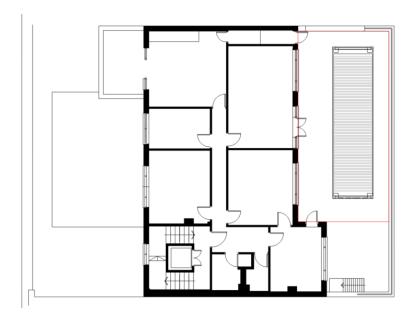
Fourth floor plan of existing building. The rooftop terrace is hatched in red.
